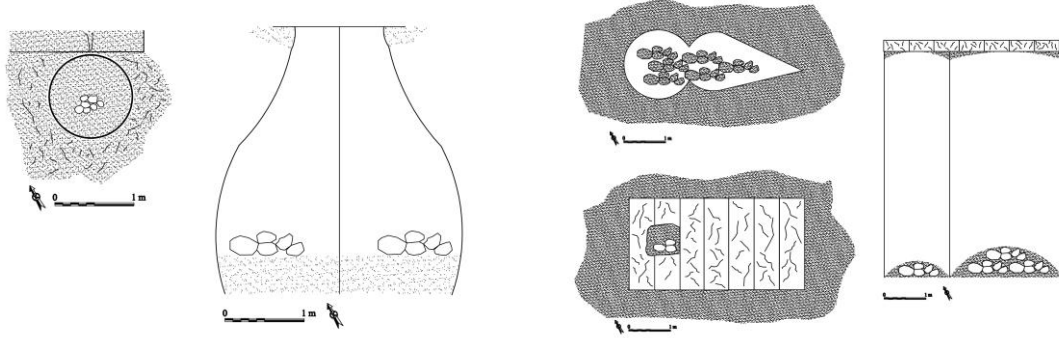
Example of bell-shaped cistern, plan and section drawing
